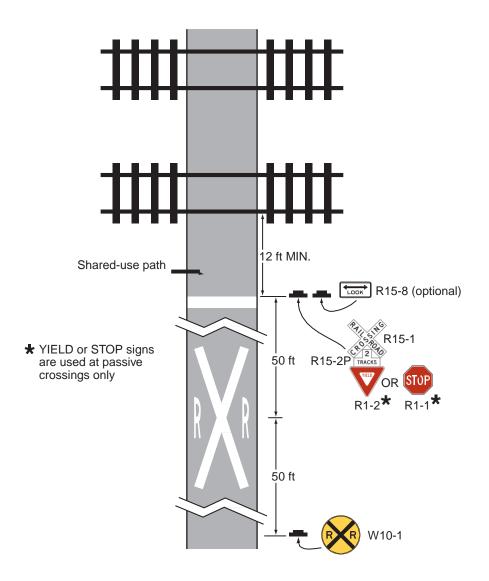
ADVANCED PAVEMENT STRIPING DETAIL
